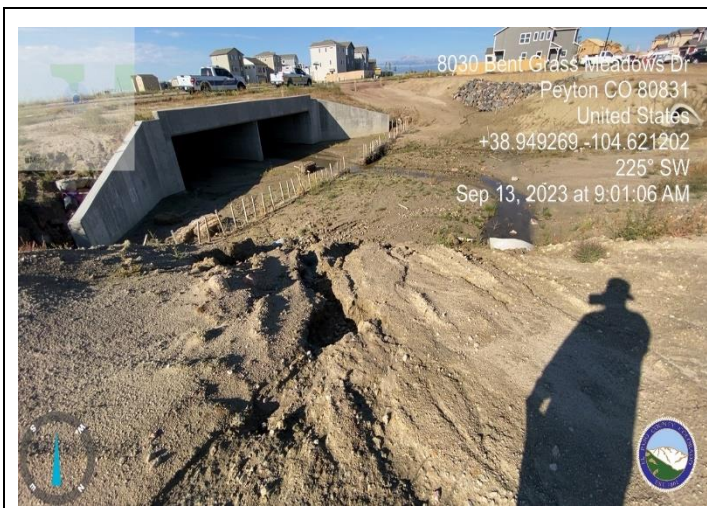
North pond outfall near cutoff wall eroding. Regrade and stabilize.
